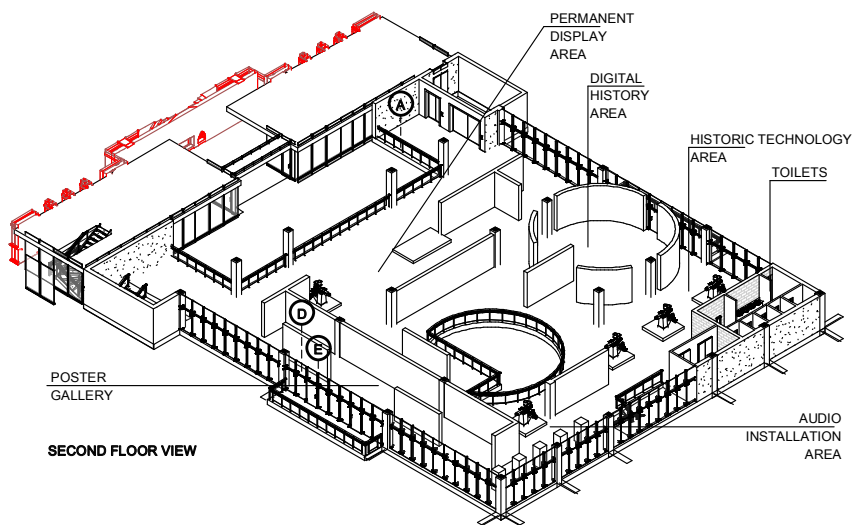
LAKSHMI BUILDING - AXNOMETRIC VIEW - SECOND FLOOR -
